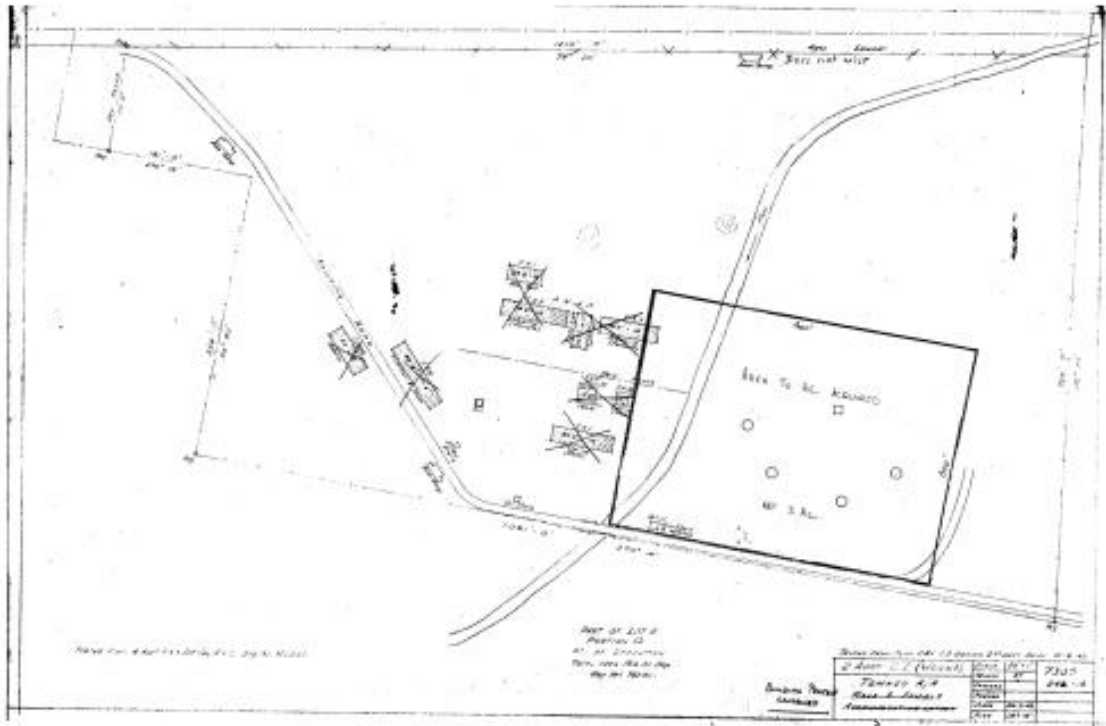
1943 plan of anti-aircraft gun emplacement site, indicating existing structures and cancelled new building project (callout shown at right).
